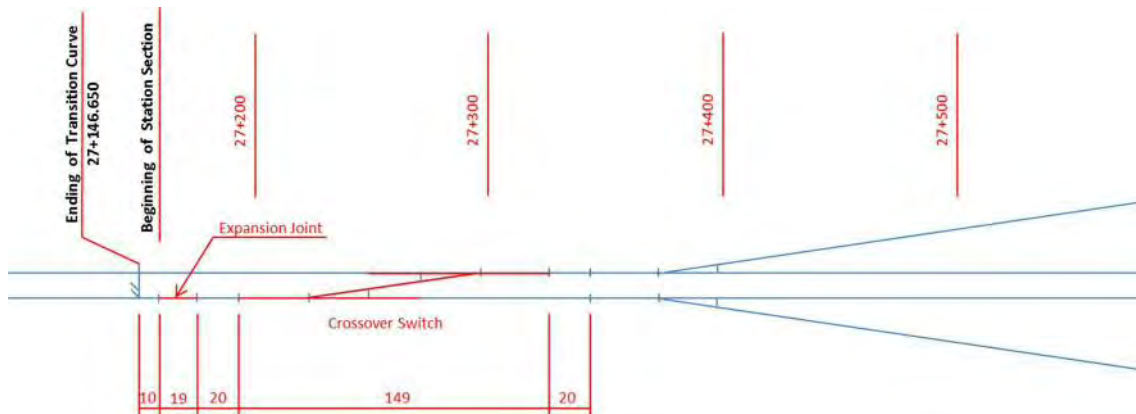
Enlarged Section View of Conversion Plan 1
